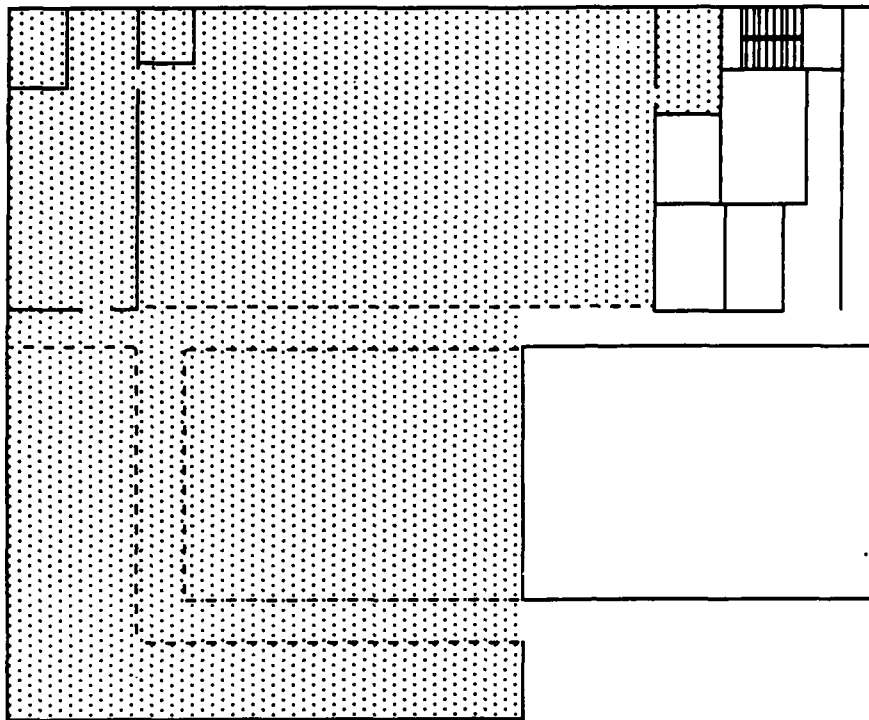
"To-Be" Fabrication Facility Floor Space Layout
